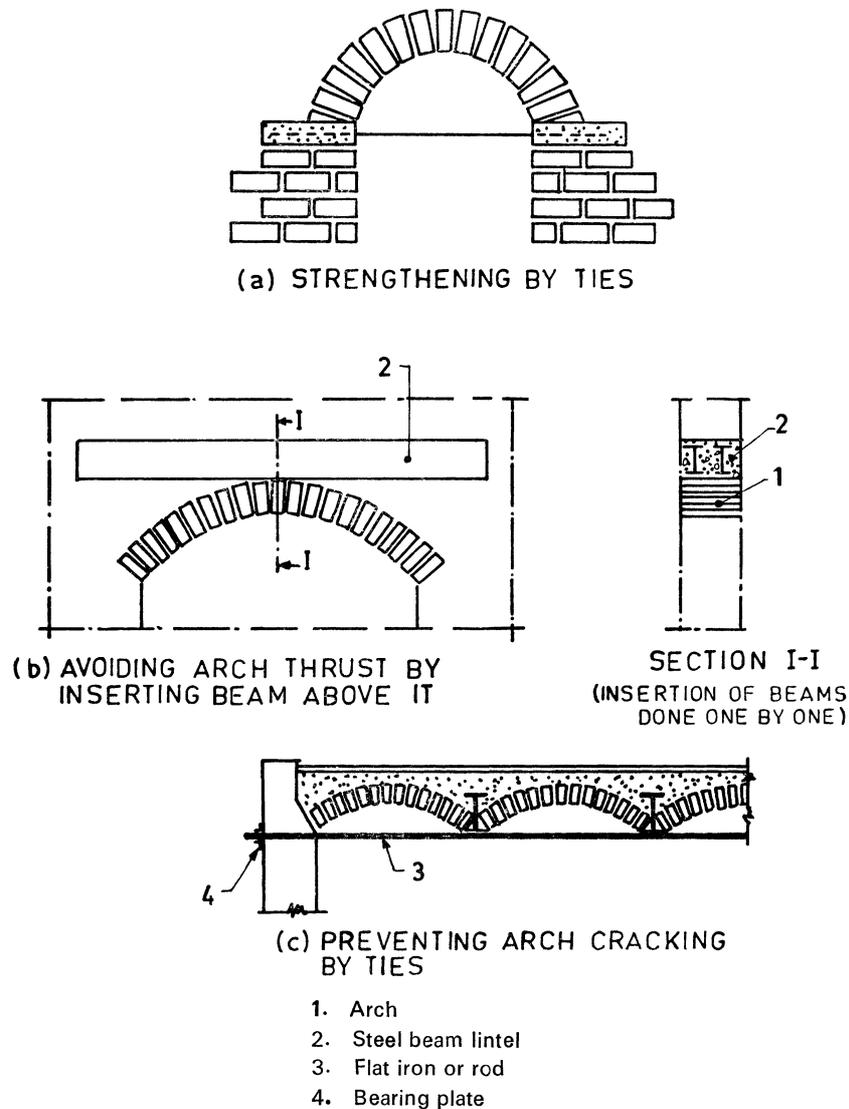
STRENGTHENING AN ARCHED OPENING IN MASONRY WALL
